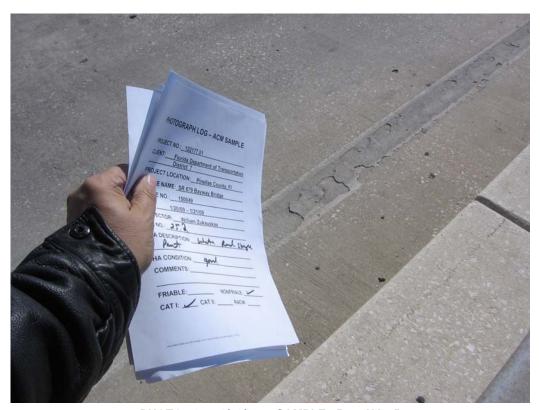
01/21/09 - SAMPLE 25.2 - HA 25 WHITE PAINT ROAD STRIPES
